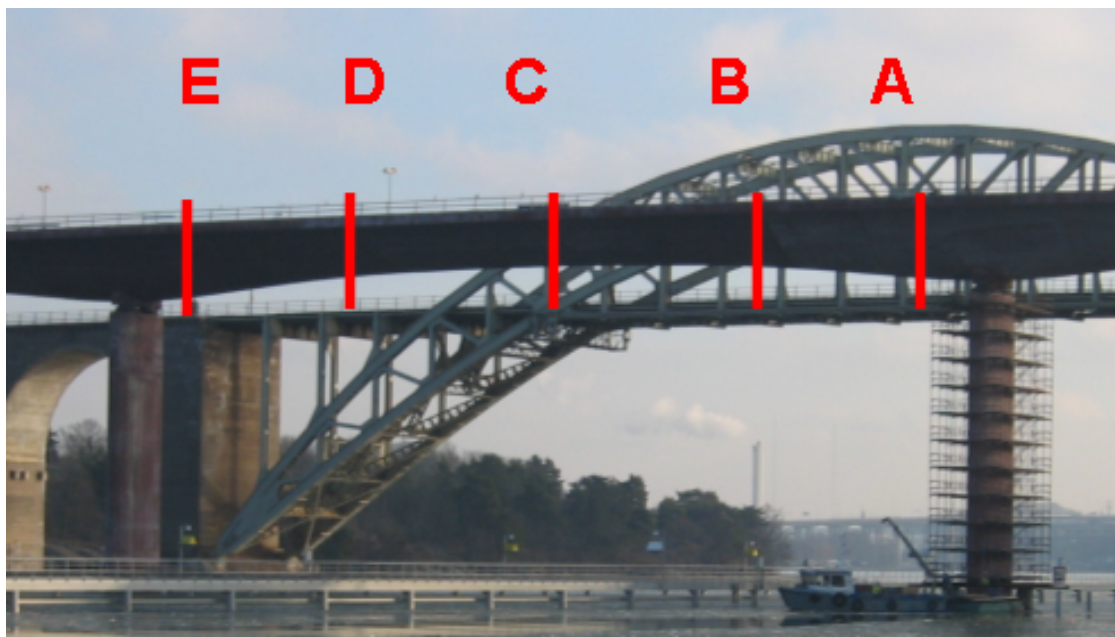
The picture shows monitored sections in the span between pier 8 and pier 9. Point A is close to pier 9. The old Årsta Bridge can be seen in the background.
